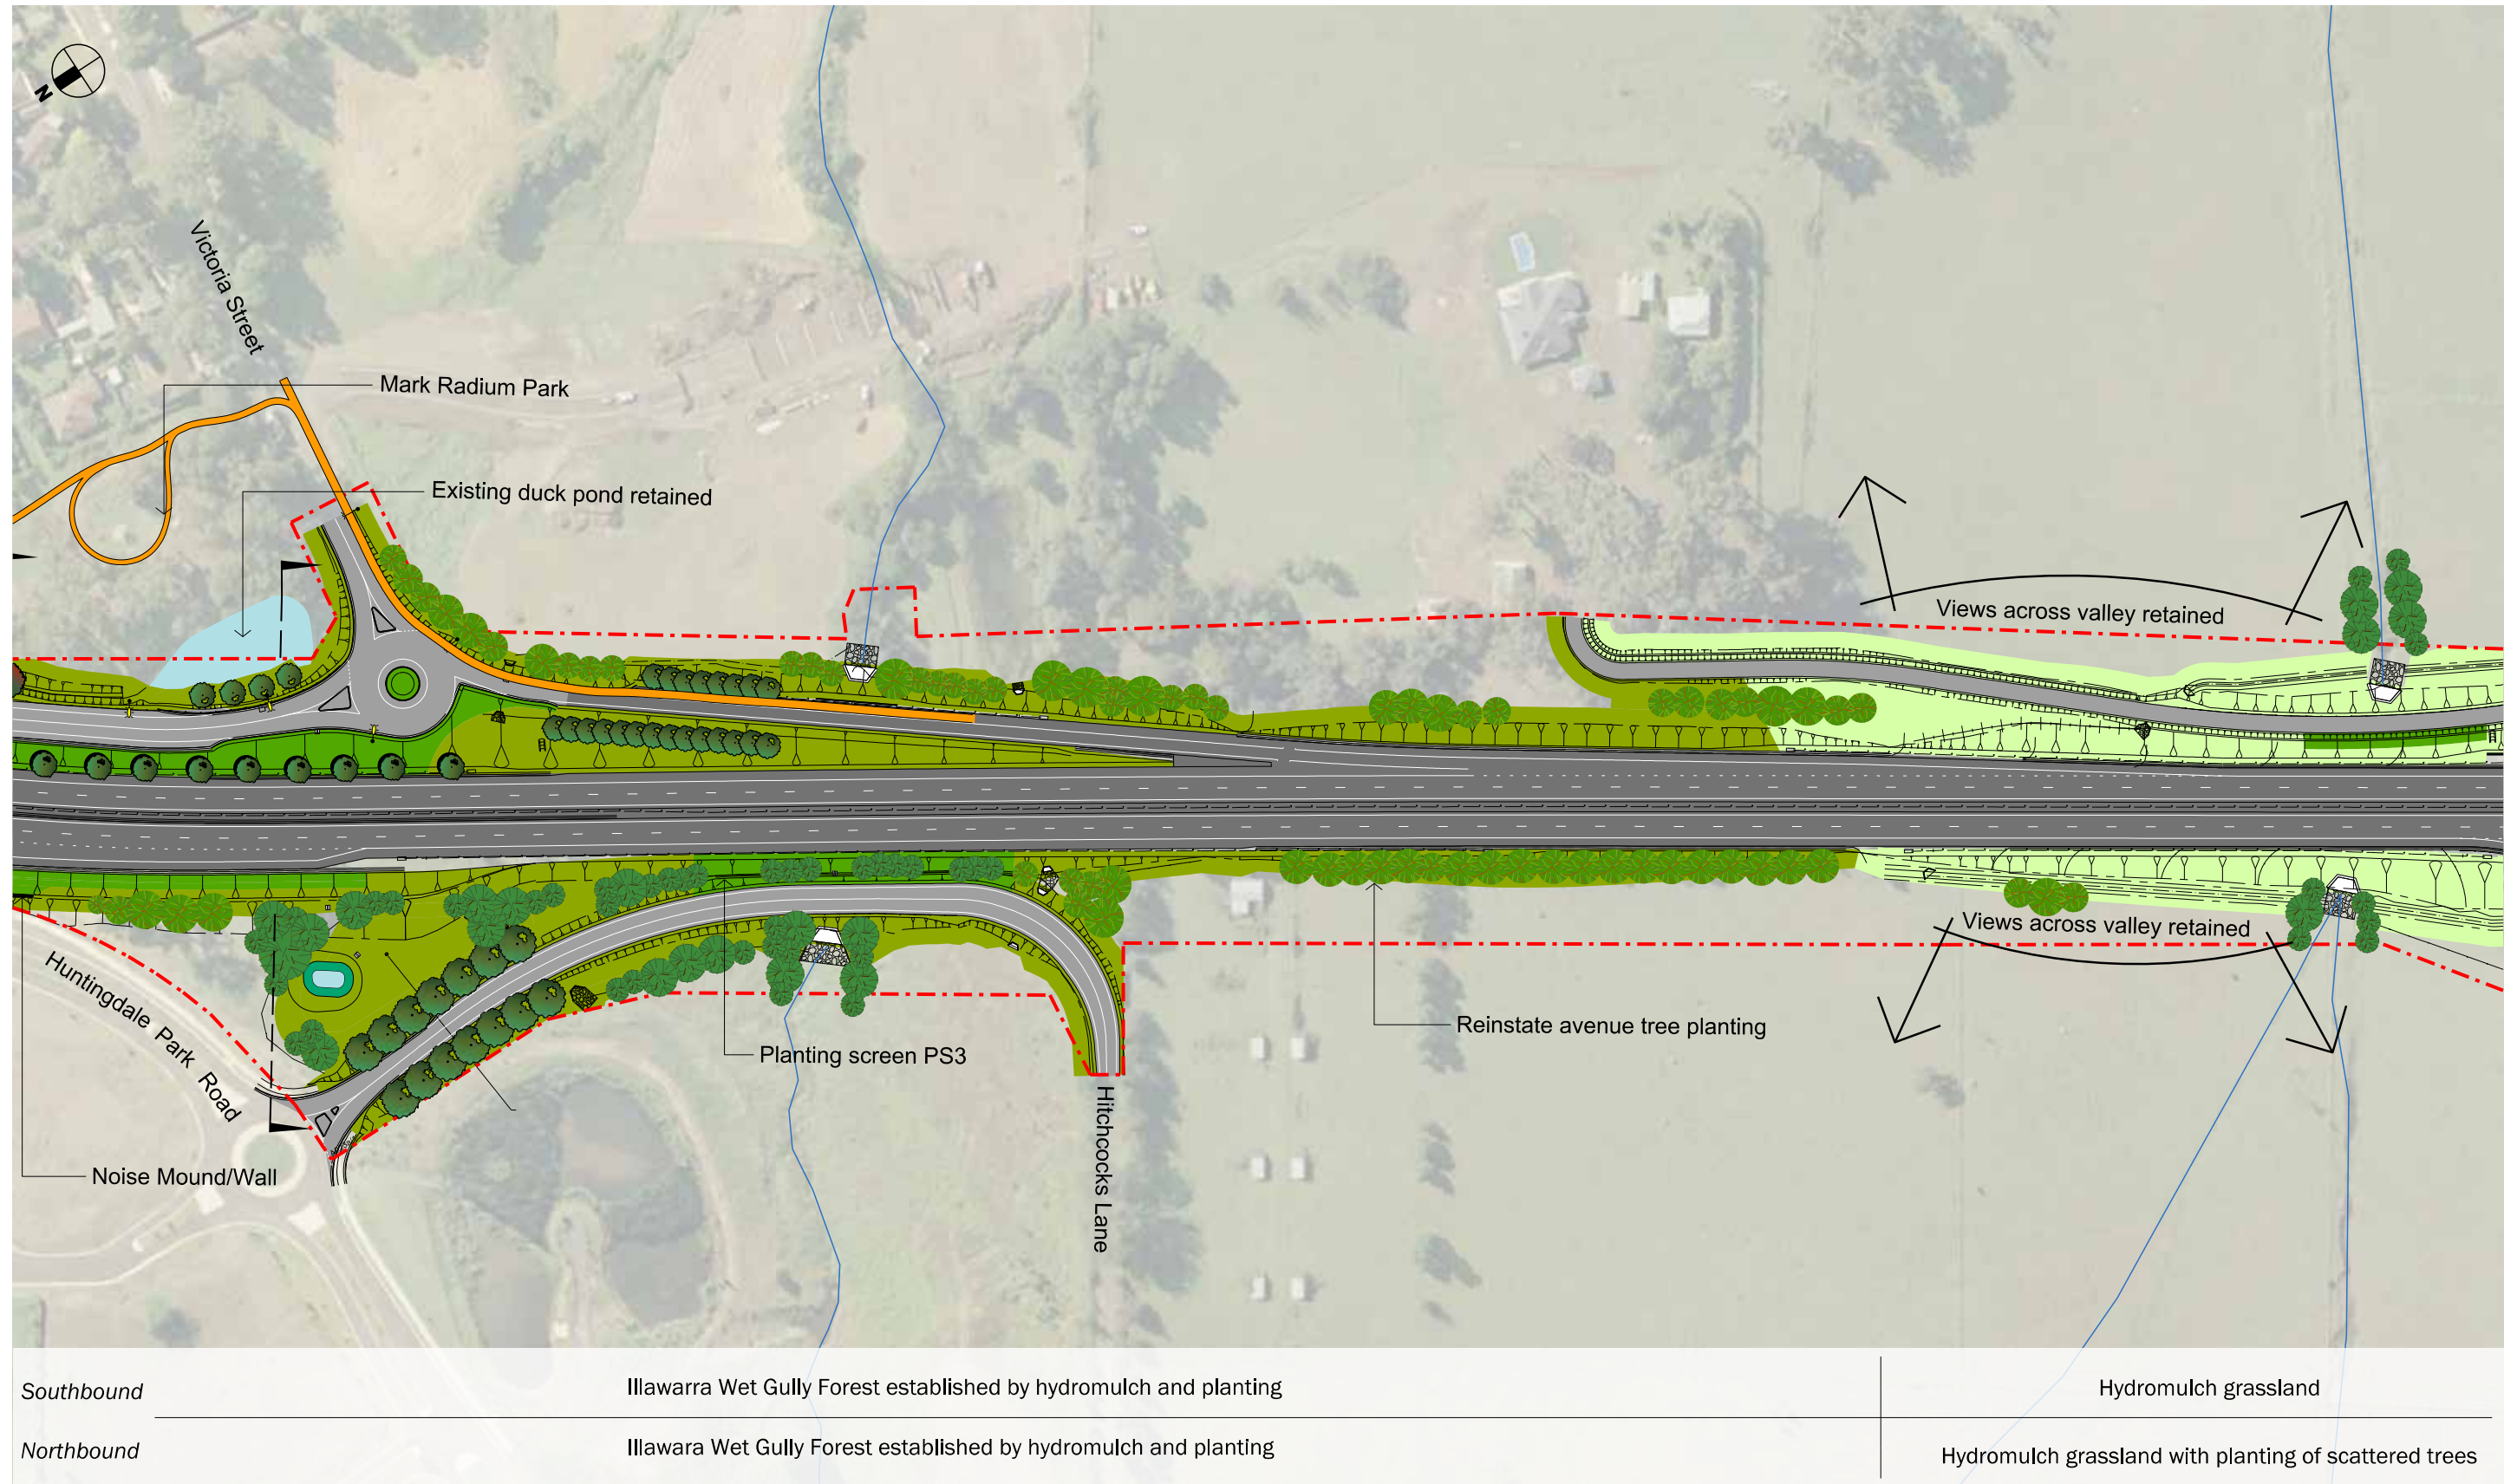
Urban and landscape design plan (Sheet 19) - Berry Character Zone
